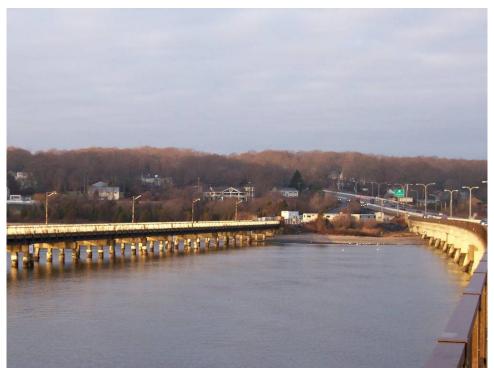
Old Jamestown Bridge Site looking west from the Jamestown-Verrazano Bridge.
